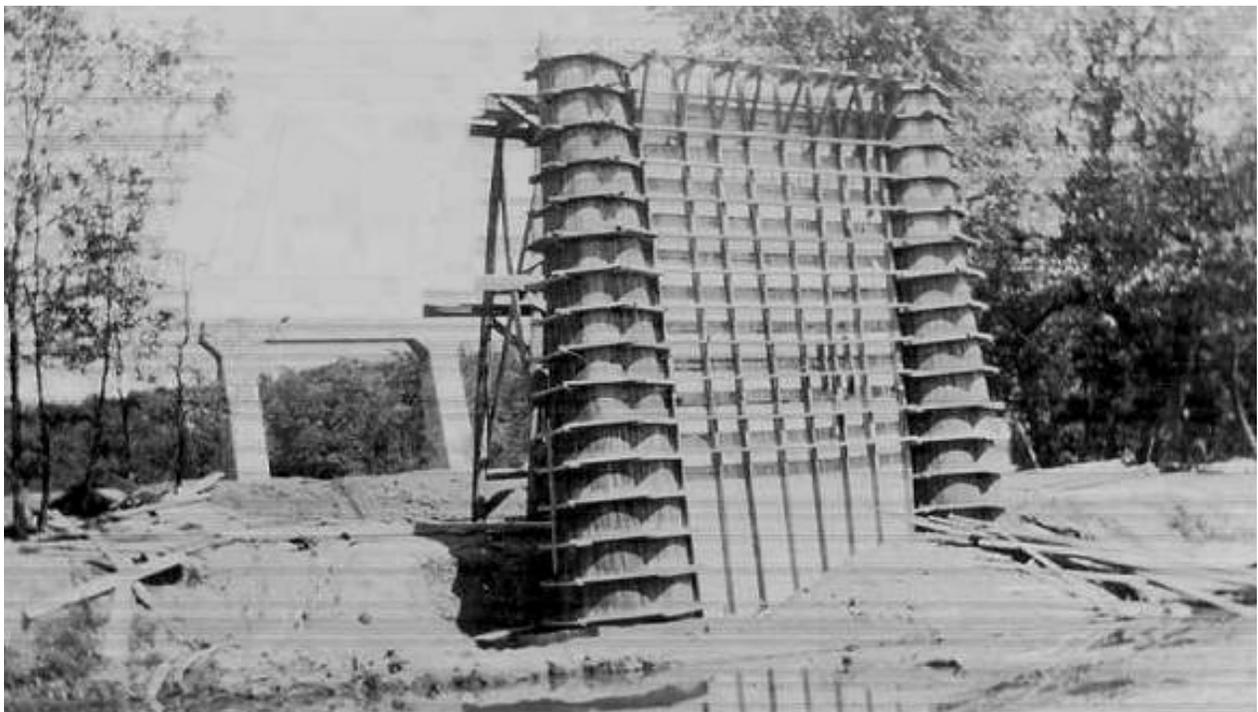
Construction pier (foreground) and end bent (photo facing northeast) (Miller County Museum and Historical Society).
